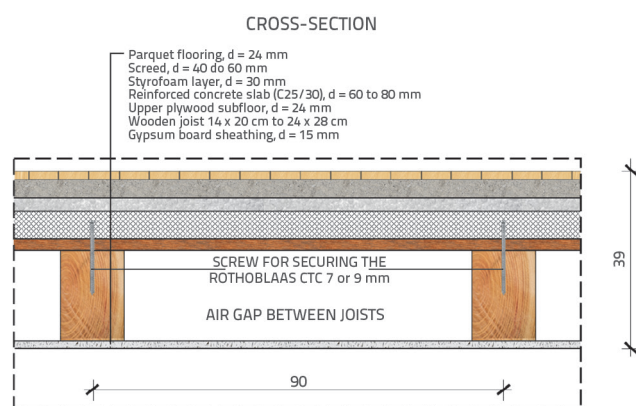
Strengthening of a floor structure with traditional timber joists without recessed infill using a reinforced concrete compression slab
